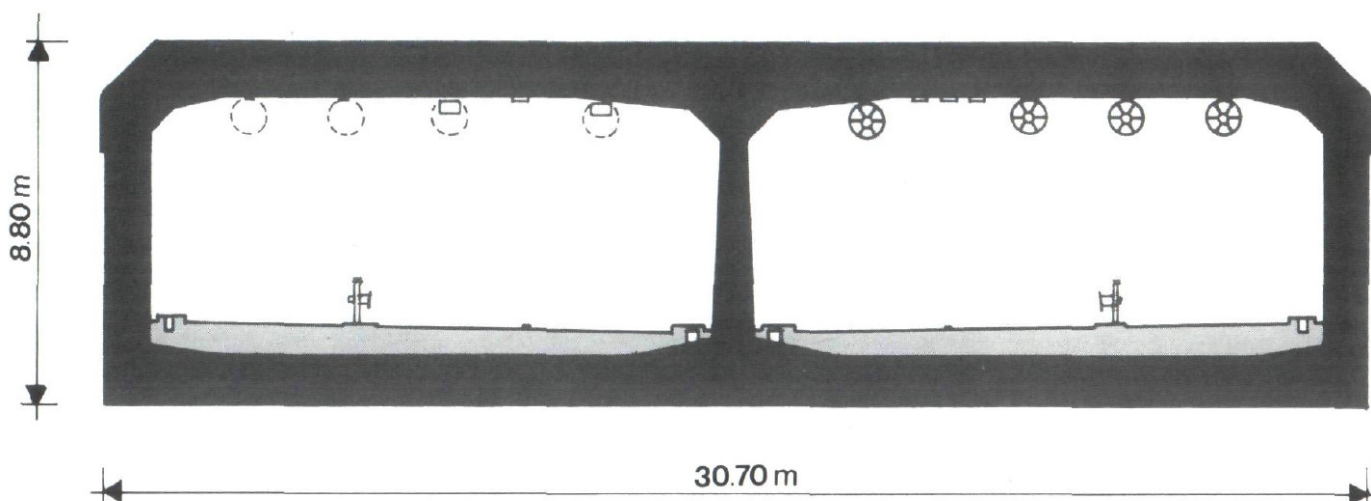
Cross-section of the Heinenoordtunnel before 1991 [21]
